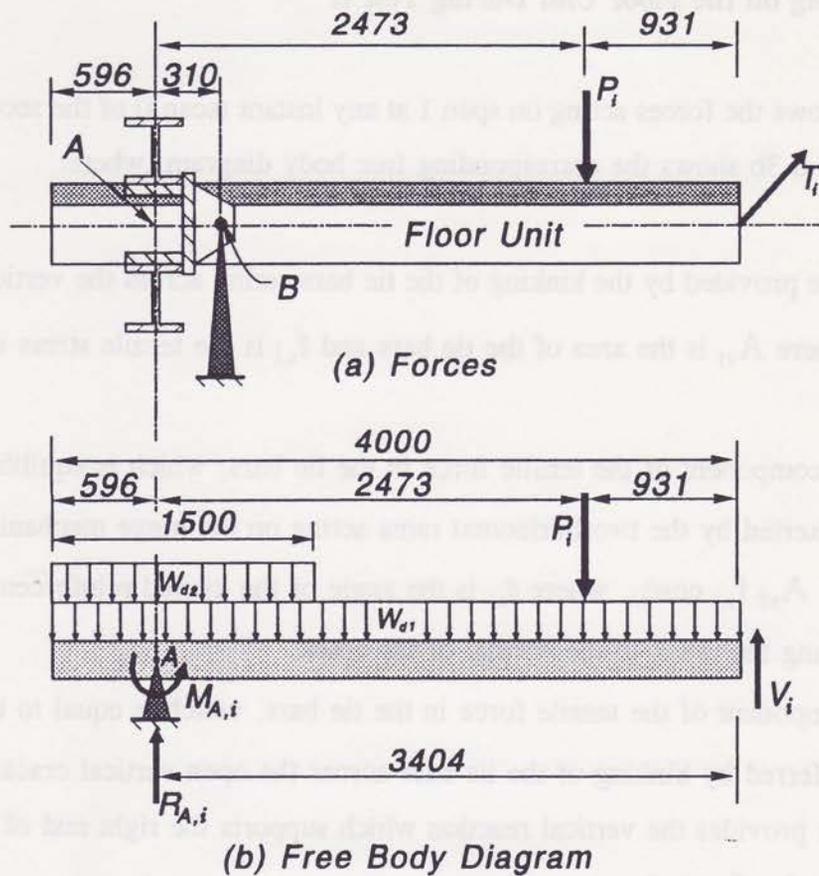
Forces Acting in Span 1 During Second Stage of Test B
